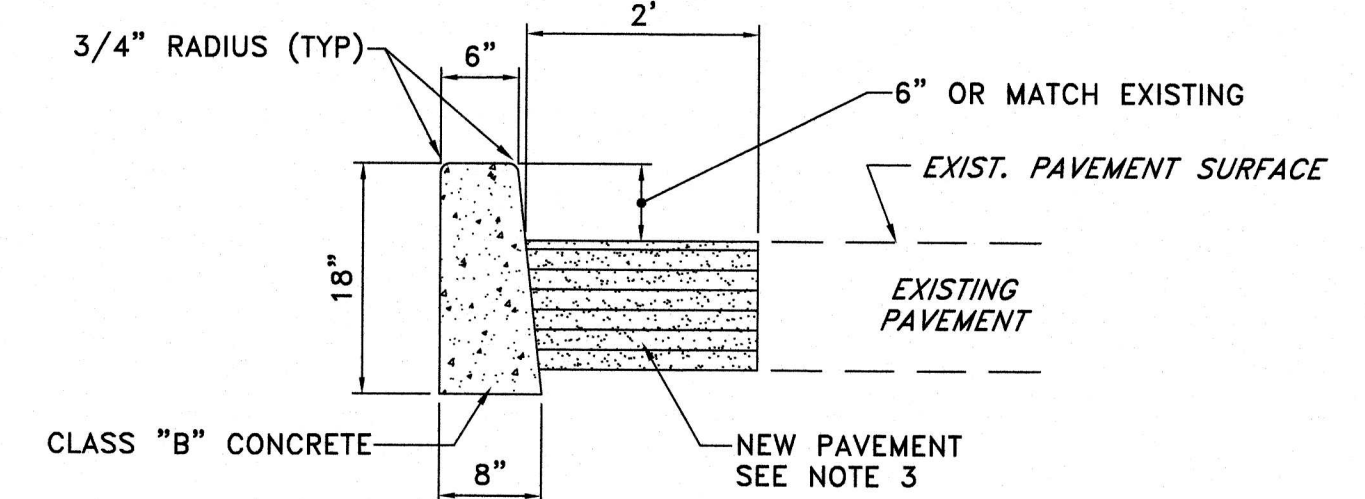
BITUMINOUS PAVEMENT RESTORATION
